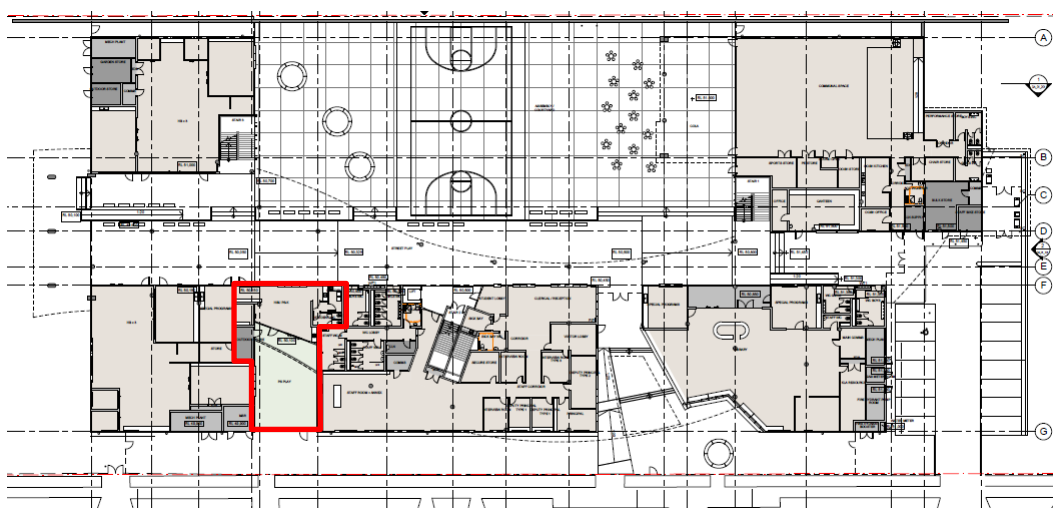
Extract of Ground Floor Plan indicating location of HSU facilities
